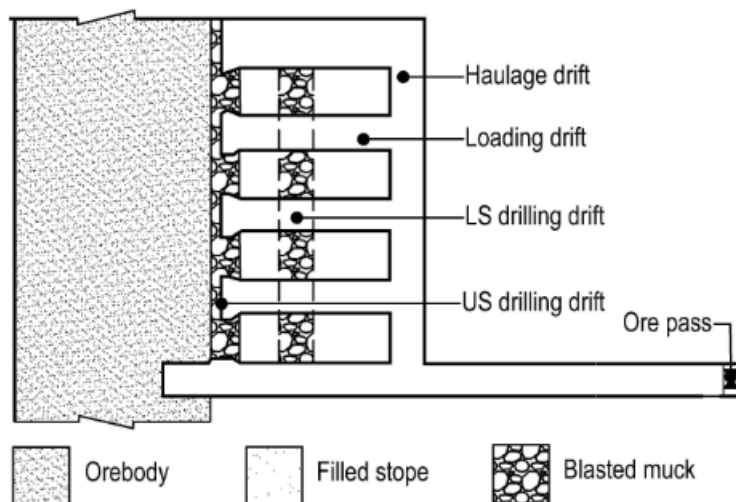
Cross section of the proposed mining method, modified after (Xu, et al. 2021)
